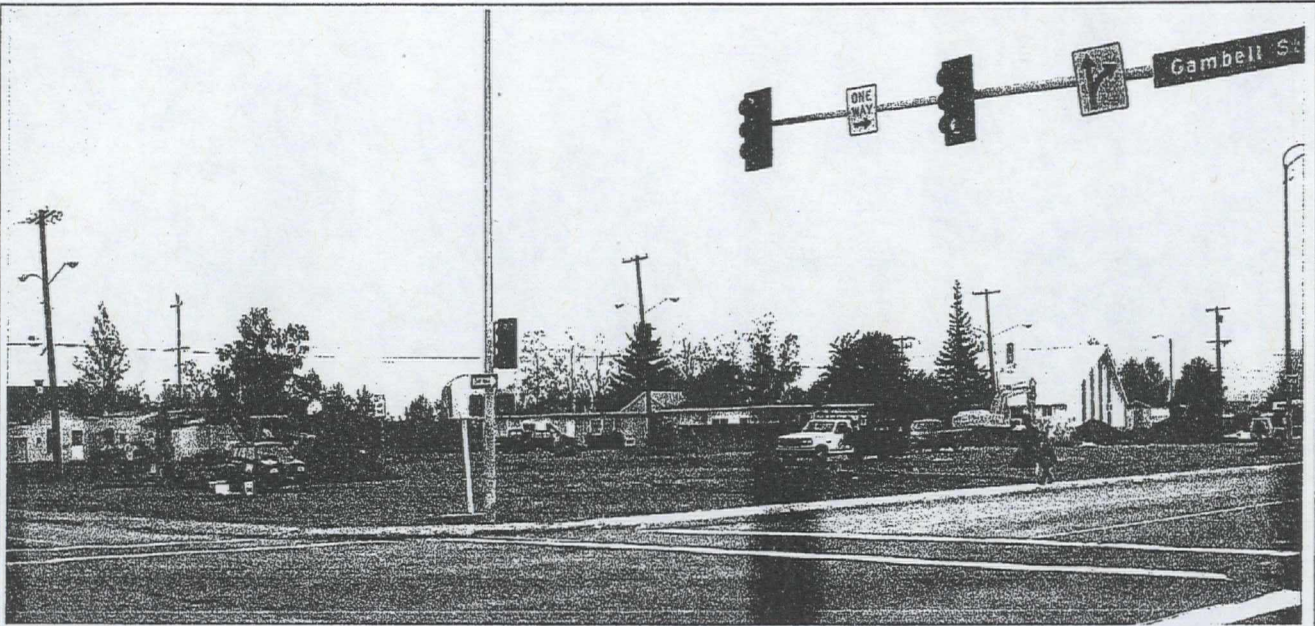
Project site (looking northeast). Excavating Test Pit TP-1 (left); removing hydraulic lifts (right).
